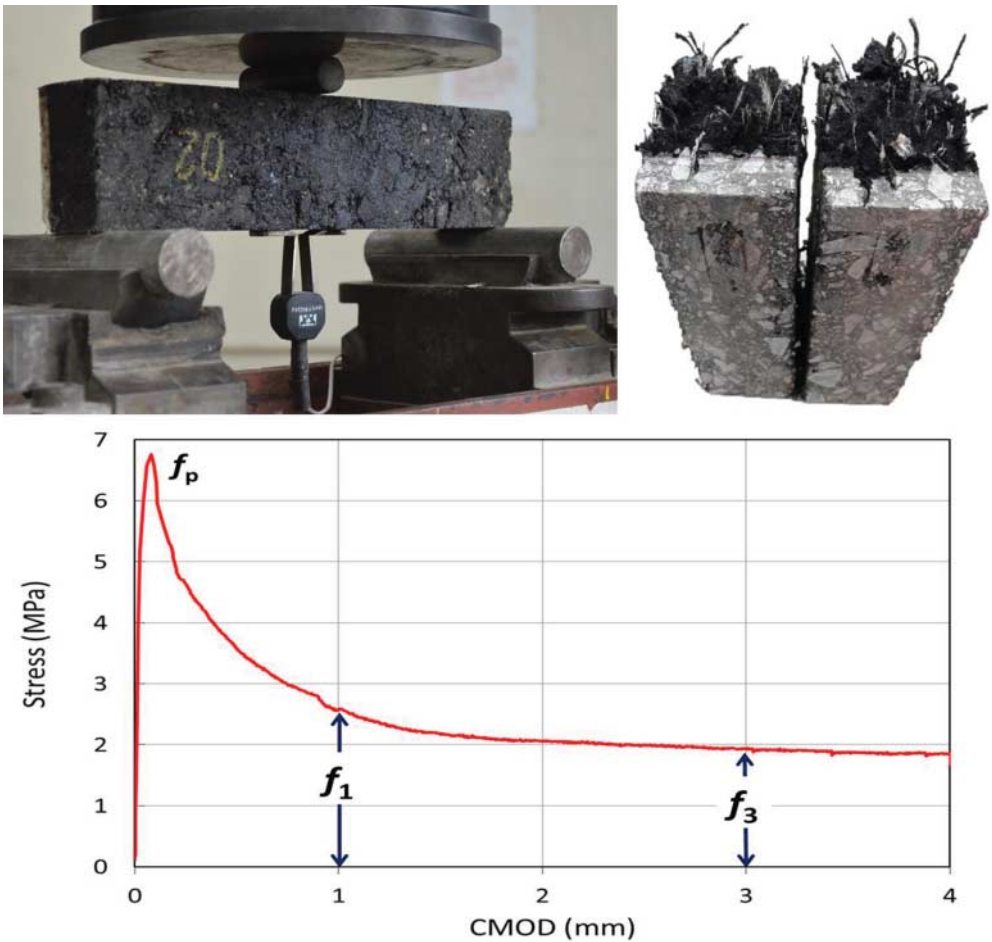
Bending test of notched beam. Left: test set up. Right: view of fracture surfaces after bending tests. Below: Typical test curve.
